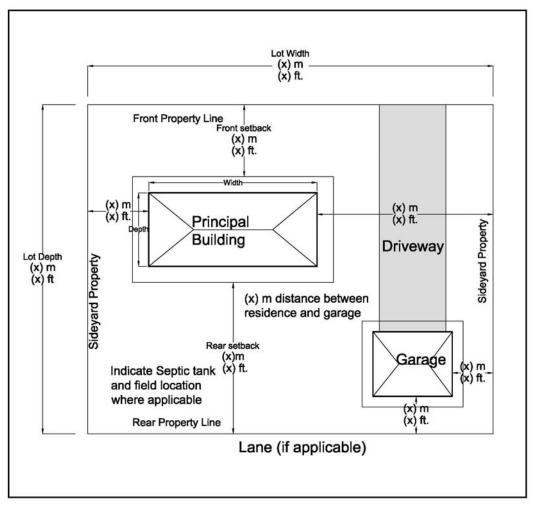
SITE PLAN FOR URBAN DEVELOPMENT PERMIT APPLICATIONS
